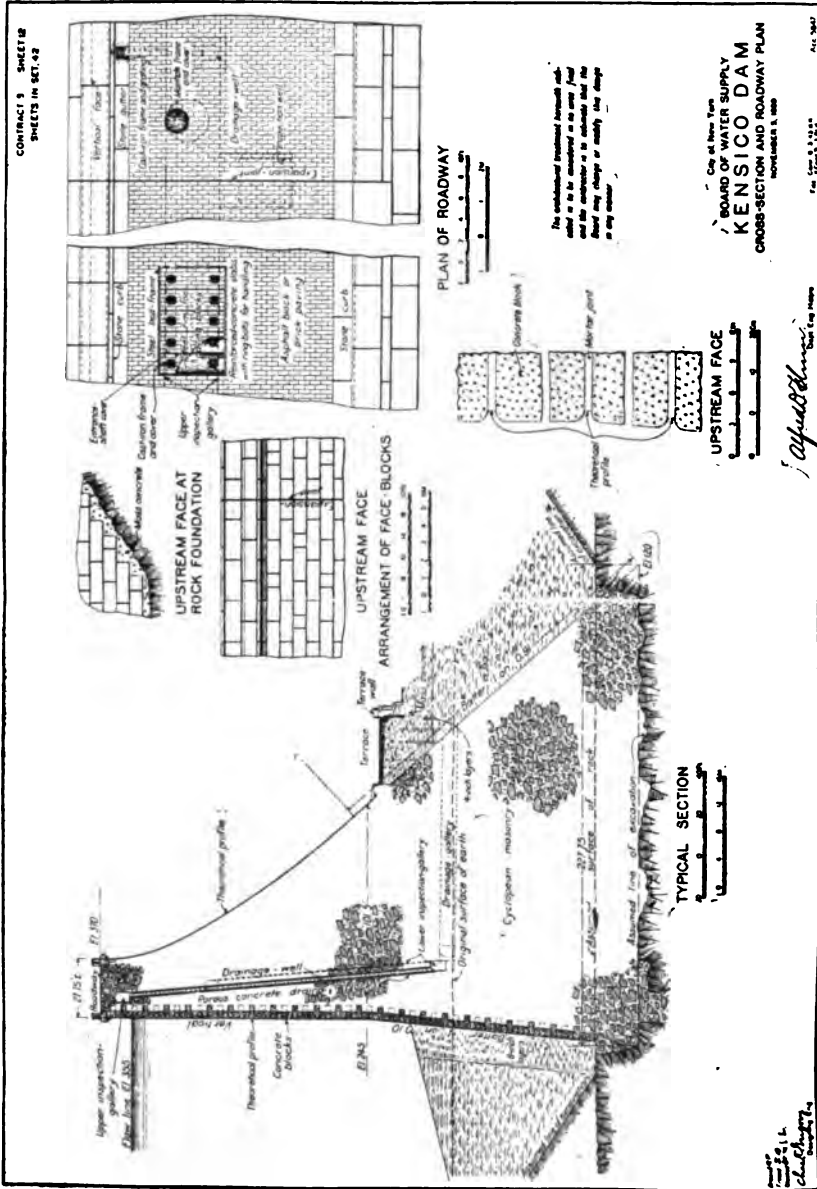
Contract 9. Kensico Dam. Typical Section, Showing Inspection Galleries, Drainage Wells, Face Blocks, Roadway, etc., According to Contract Drawings.
